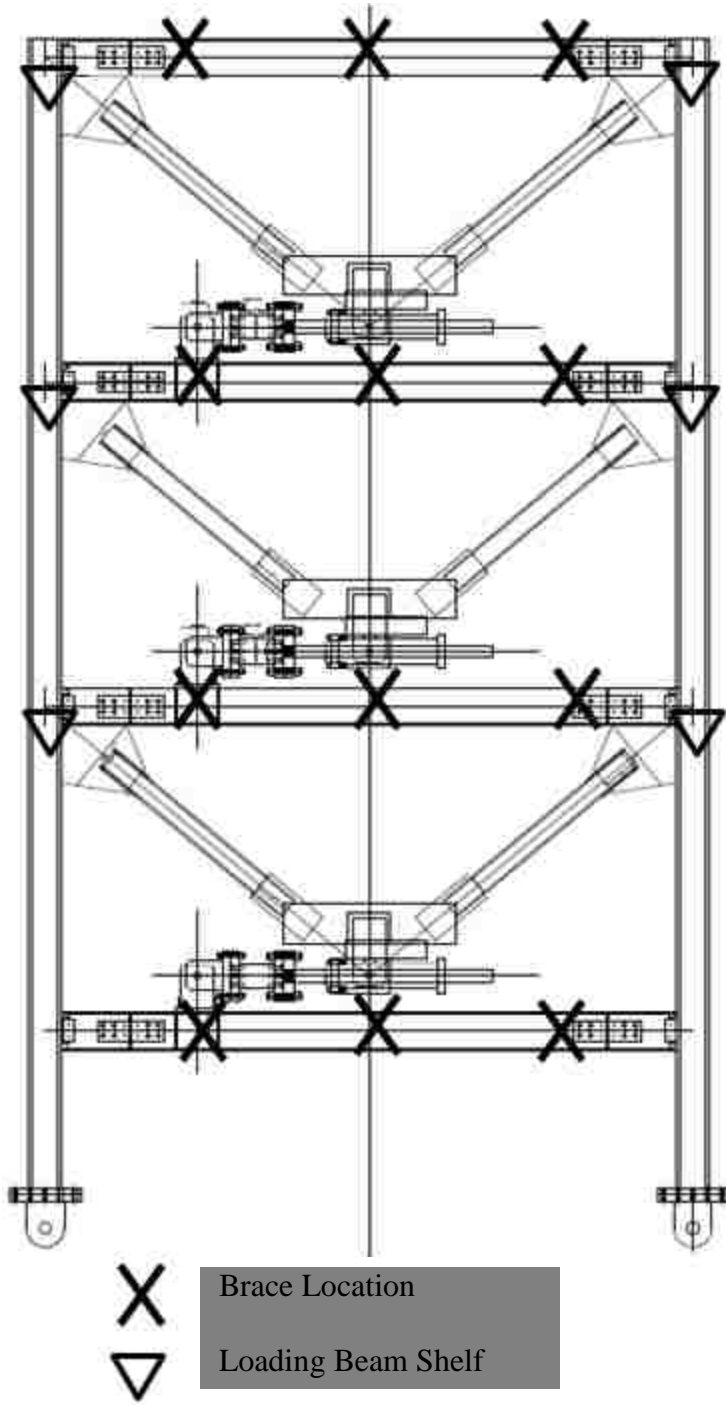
Locations of DBF lateral bracing and loading beam shelves
